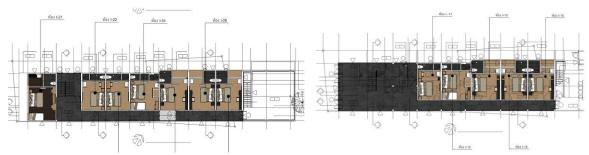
"I-River Chiang Mai" Hotel Plans of Ground and 2nd Floor of "Hotel section" consists of 12 guest rooms
